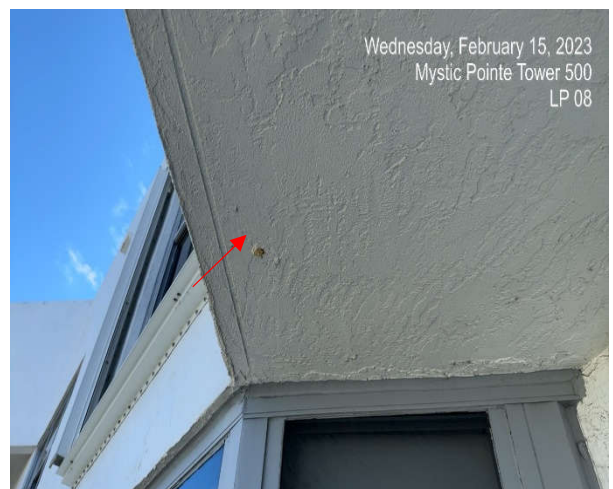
b.4 – Rust spot at the balcony ceiling (LP 08)
